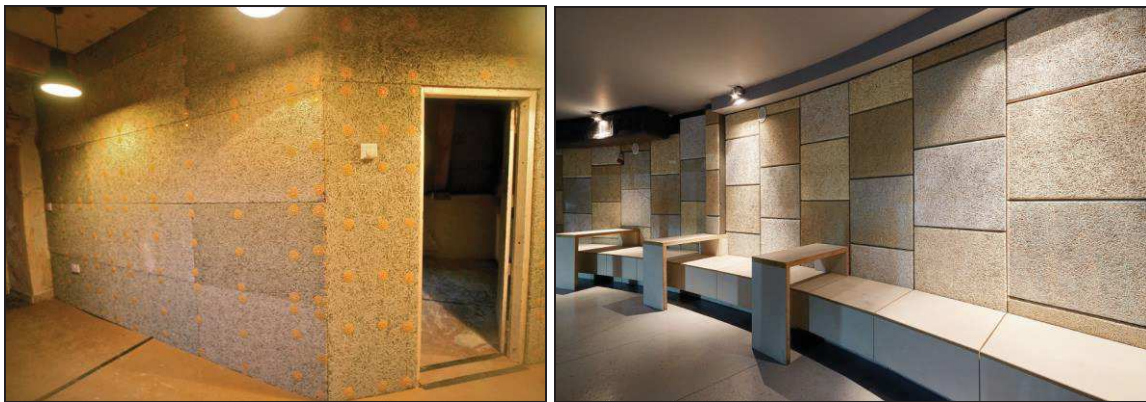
Examples of wood wool partition walls (source: www.theconstructor.org).
